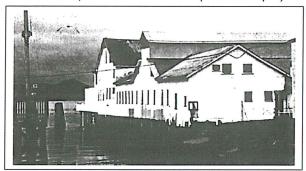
Industrial Building, Multiple Gables, Monitor Roof, and Shallow Eaves (BVO Example)
